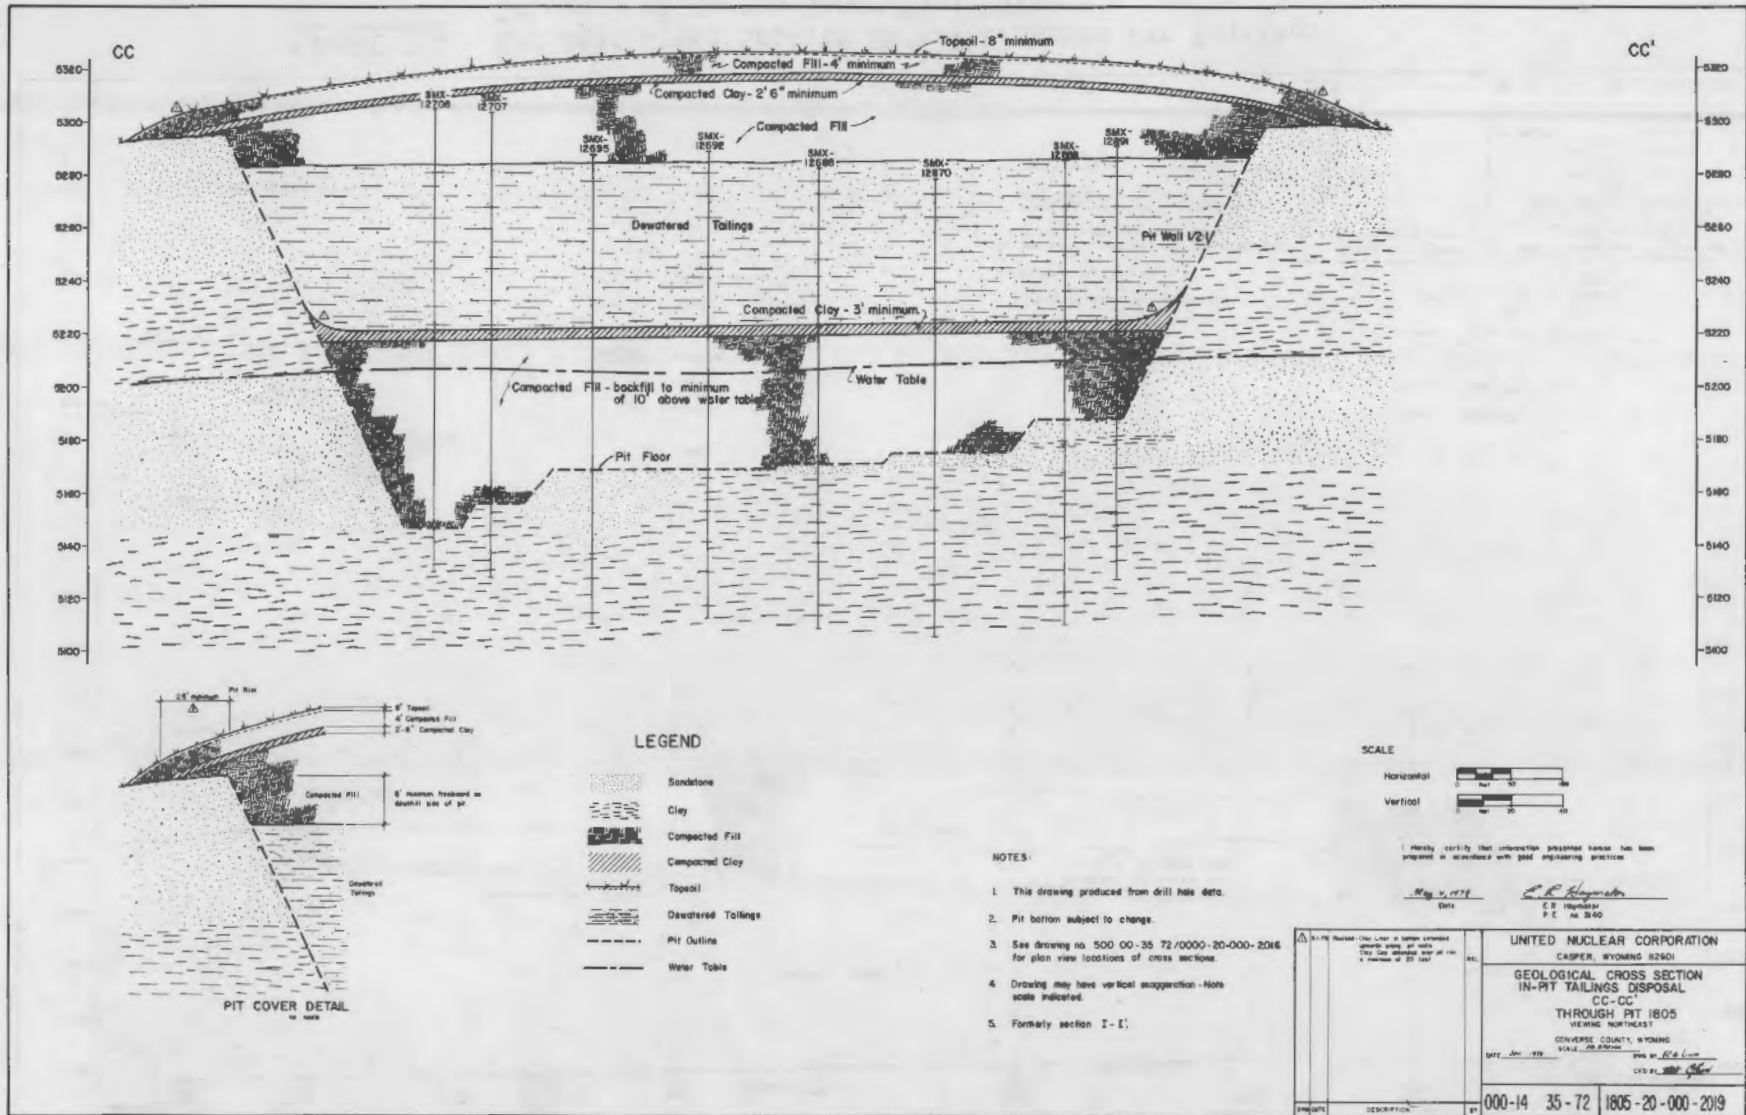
Geologic Cross Section CC' of Proposed Pit Tailings Disposal System at Morton Ranch Mill Site
